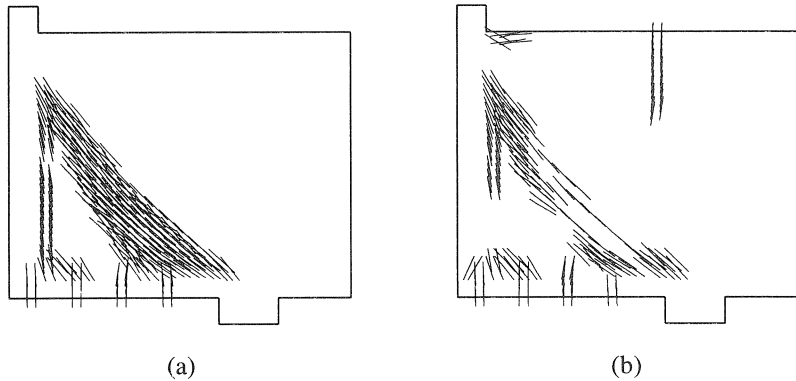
Deep beam v023 Lehwalter. Crack pattern. (a) at maximum load ; (b) at final load
